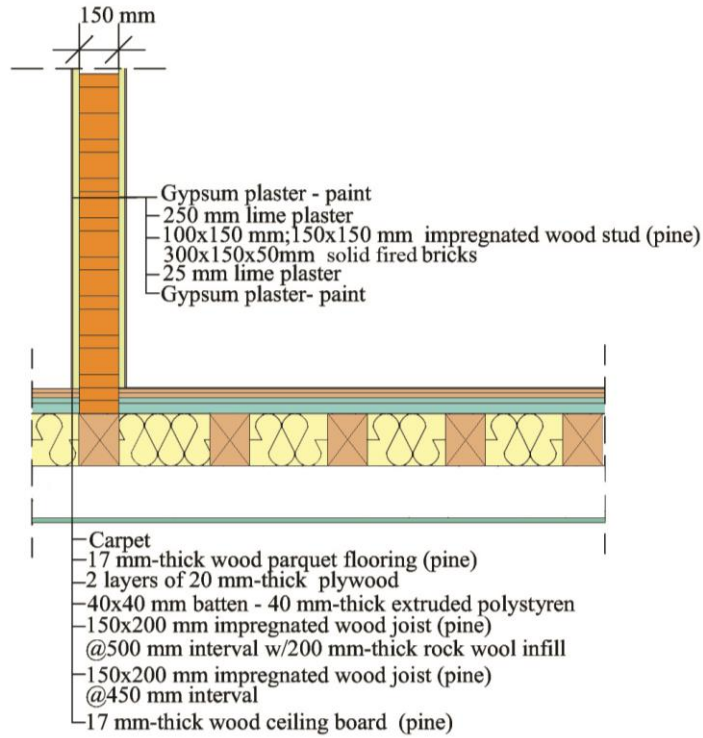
Sections of Reconstructed-Wall 1 & Reconstructed-Floor 1 in 1/20 scale
